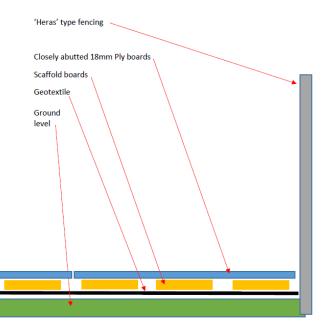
above showing an alternative method for ground protection where construction is less intense.
